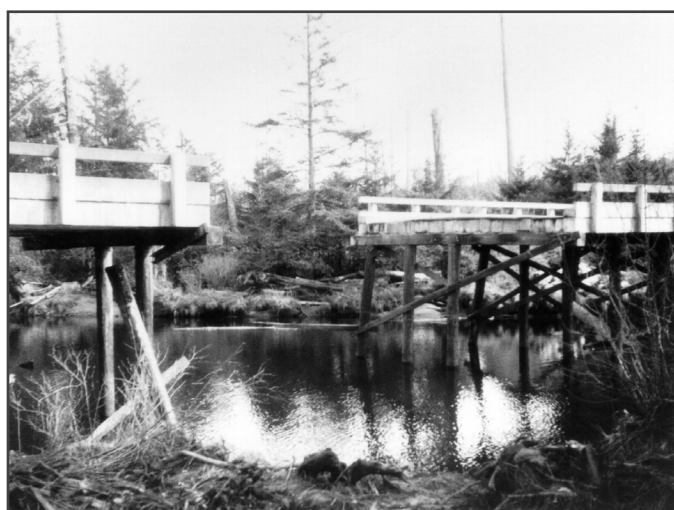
Destruction of Highway 109 Joe Creek Bridge, following tsunami inundation from the 1964 Great Alaska Earthquake. Pilings were lost, damaged, and bent. Two 20-ft (6.1 m) reinforced concrete spans were also lost. Photo from Hogan and others (1964).
